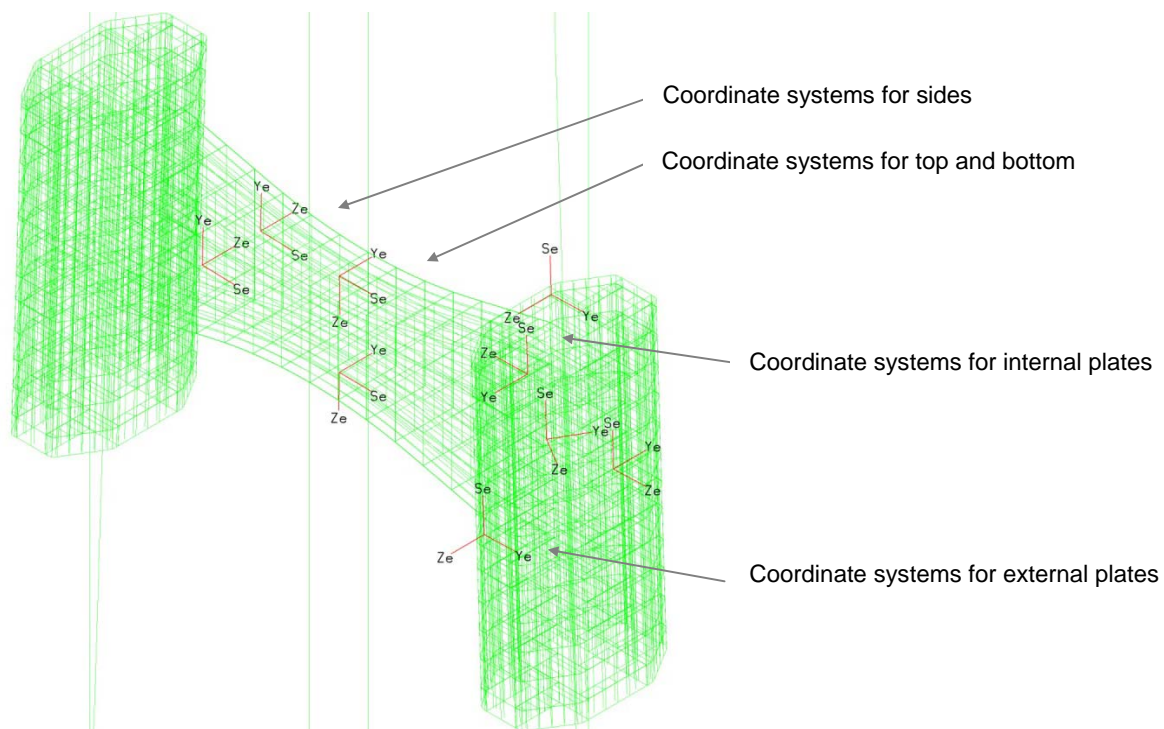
Element coordinate systems (left hand) at tower legs and tower cross beams.
